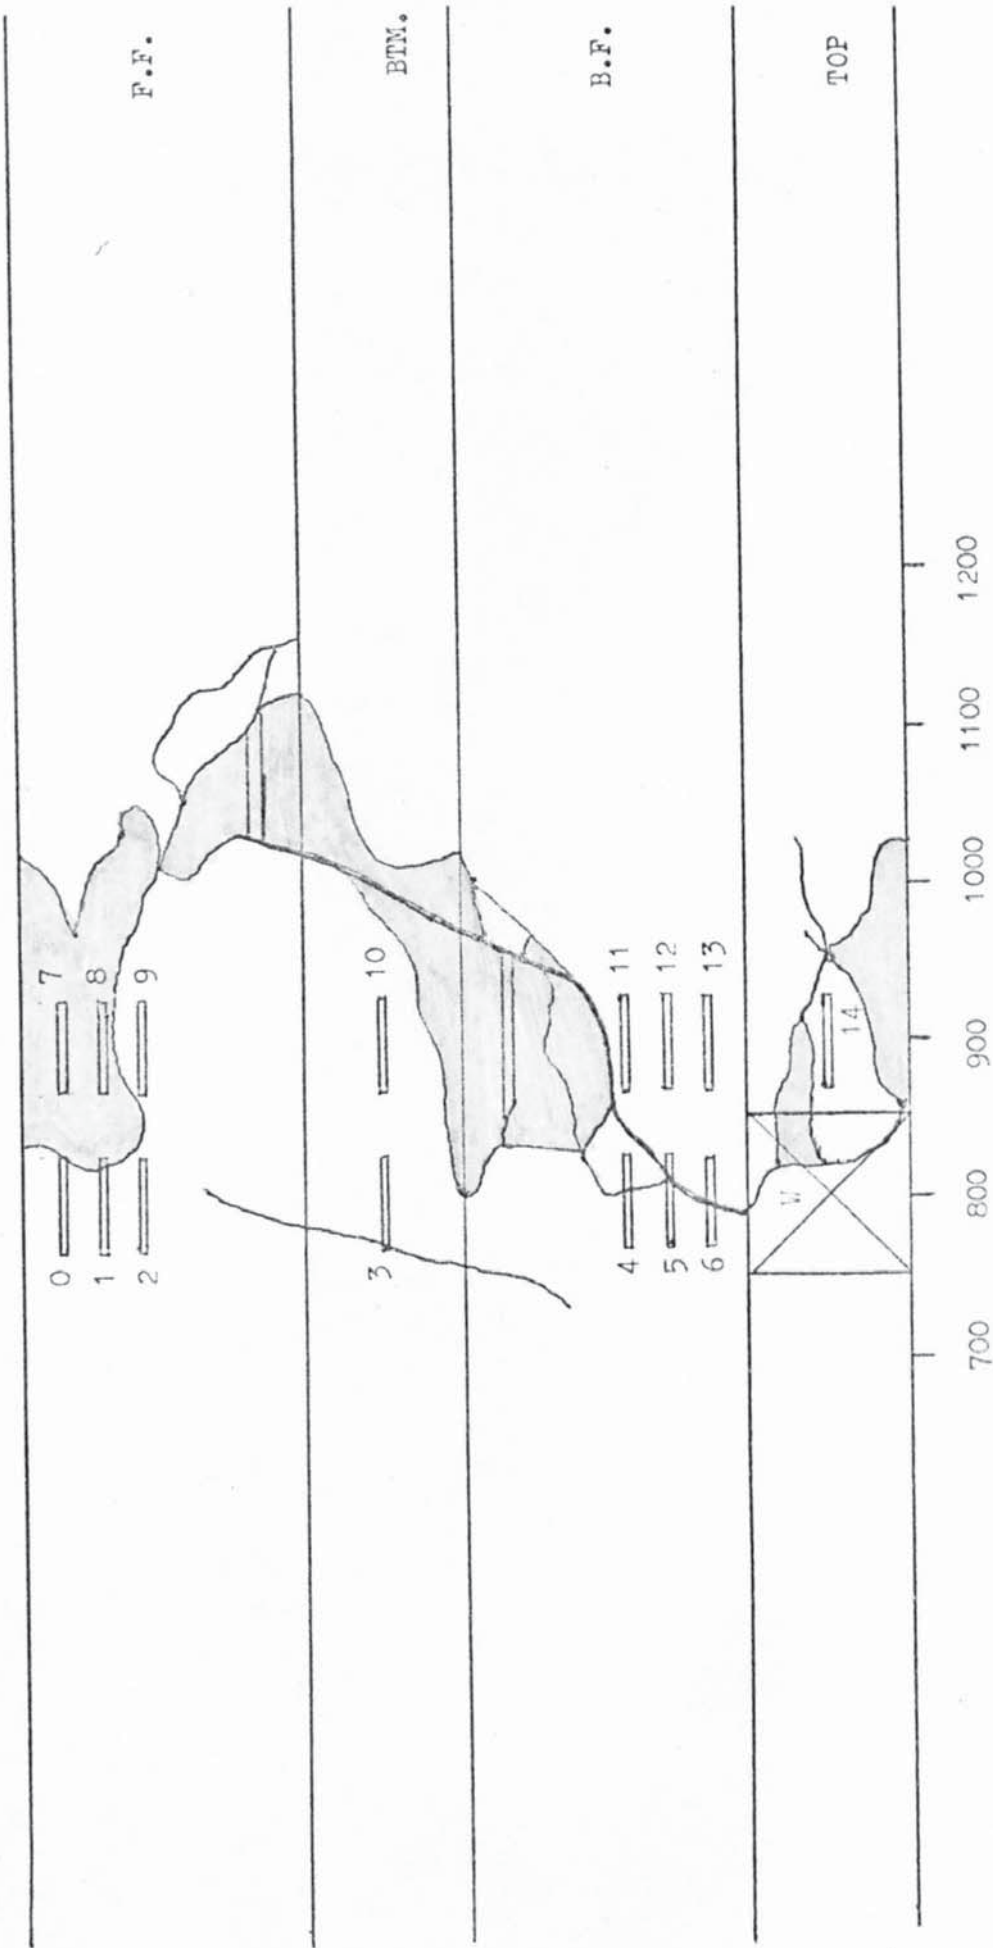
FAILURE CRACK PATTERNS - BEAM 37 ( MODE 1 )
